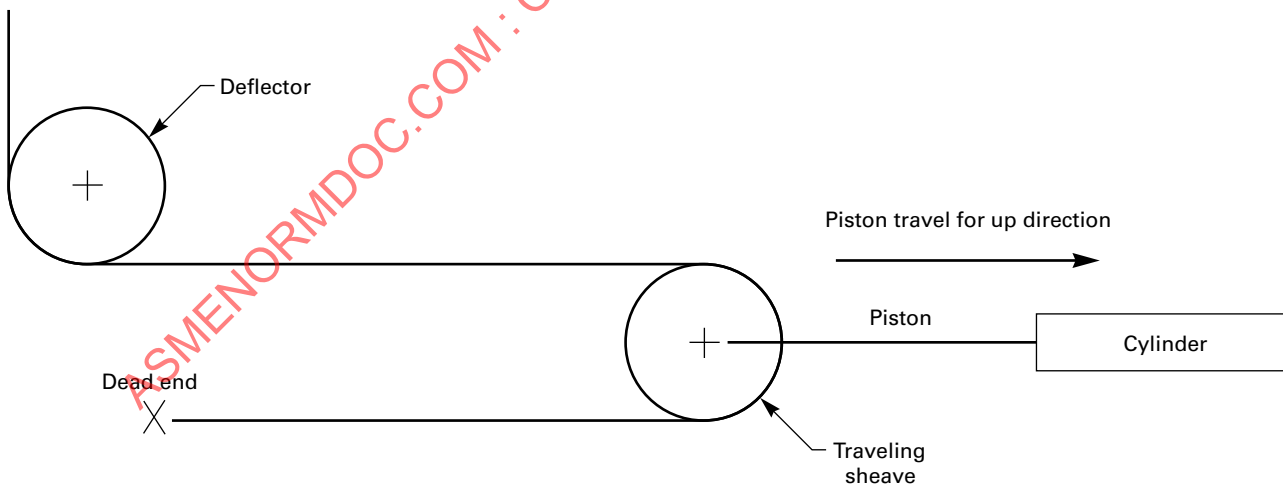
Puller-Type Roped-Hydraulic Elevators
